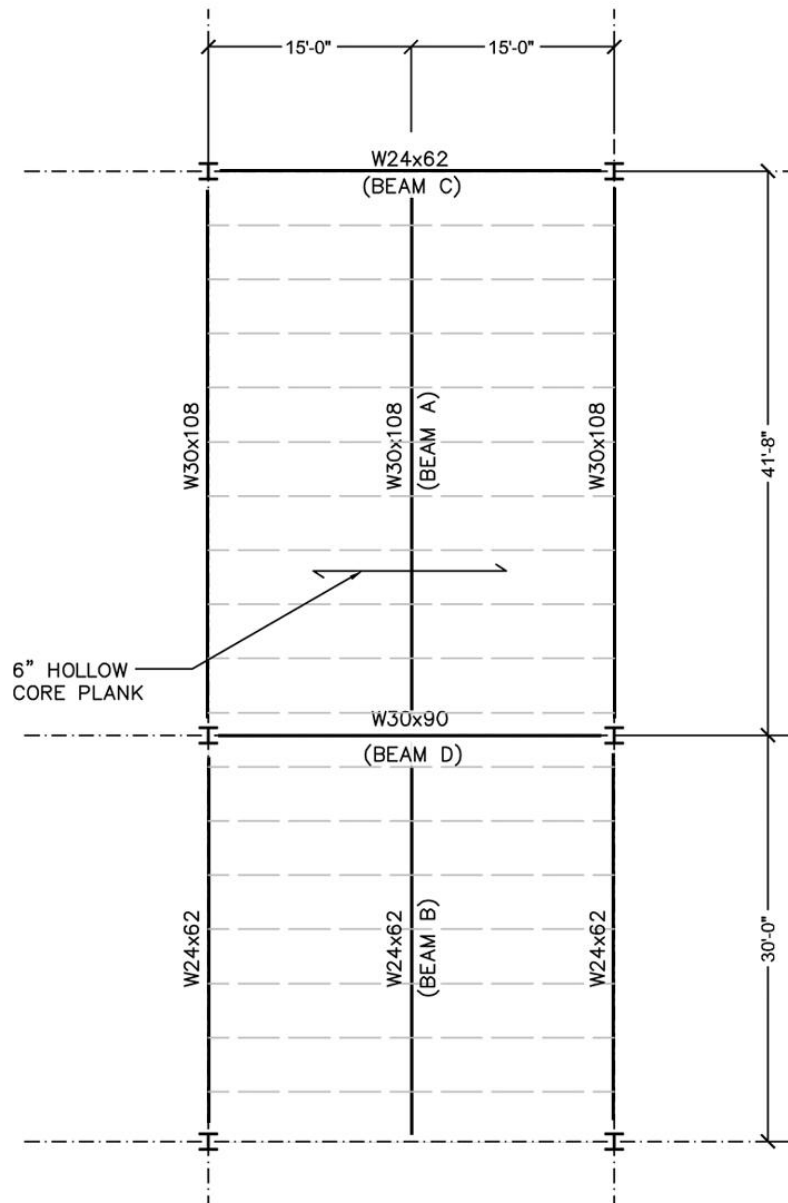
TYPICAL HOLLOW CORE LAYOUT
